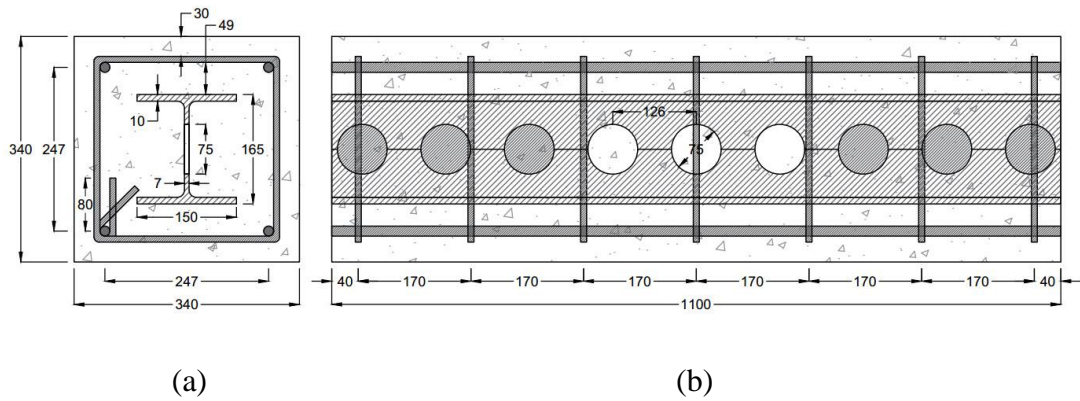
Reinforcement details of C2-170 (A) and C2-170 (B) columns; (a) cross-section; and (b) longitudinal section (dimensions in mm).
